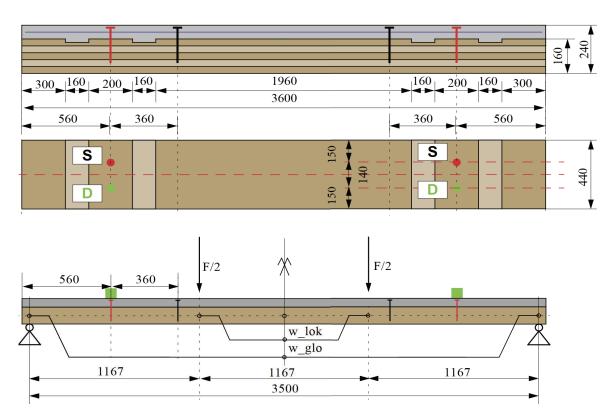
Geometry of the test specimen (top) and test setup following EN 408 [3] (bottom)
